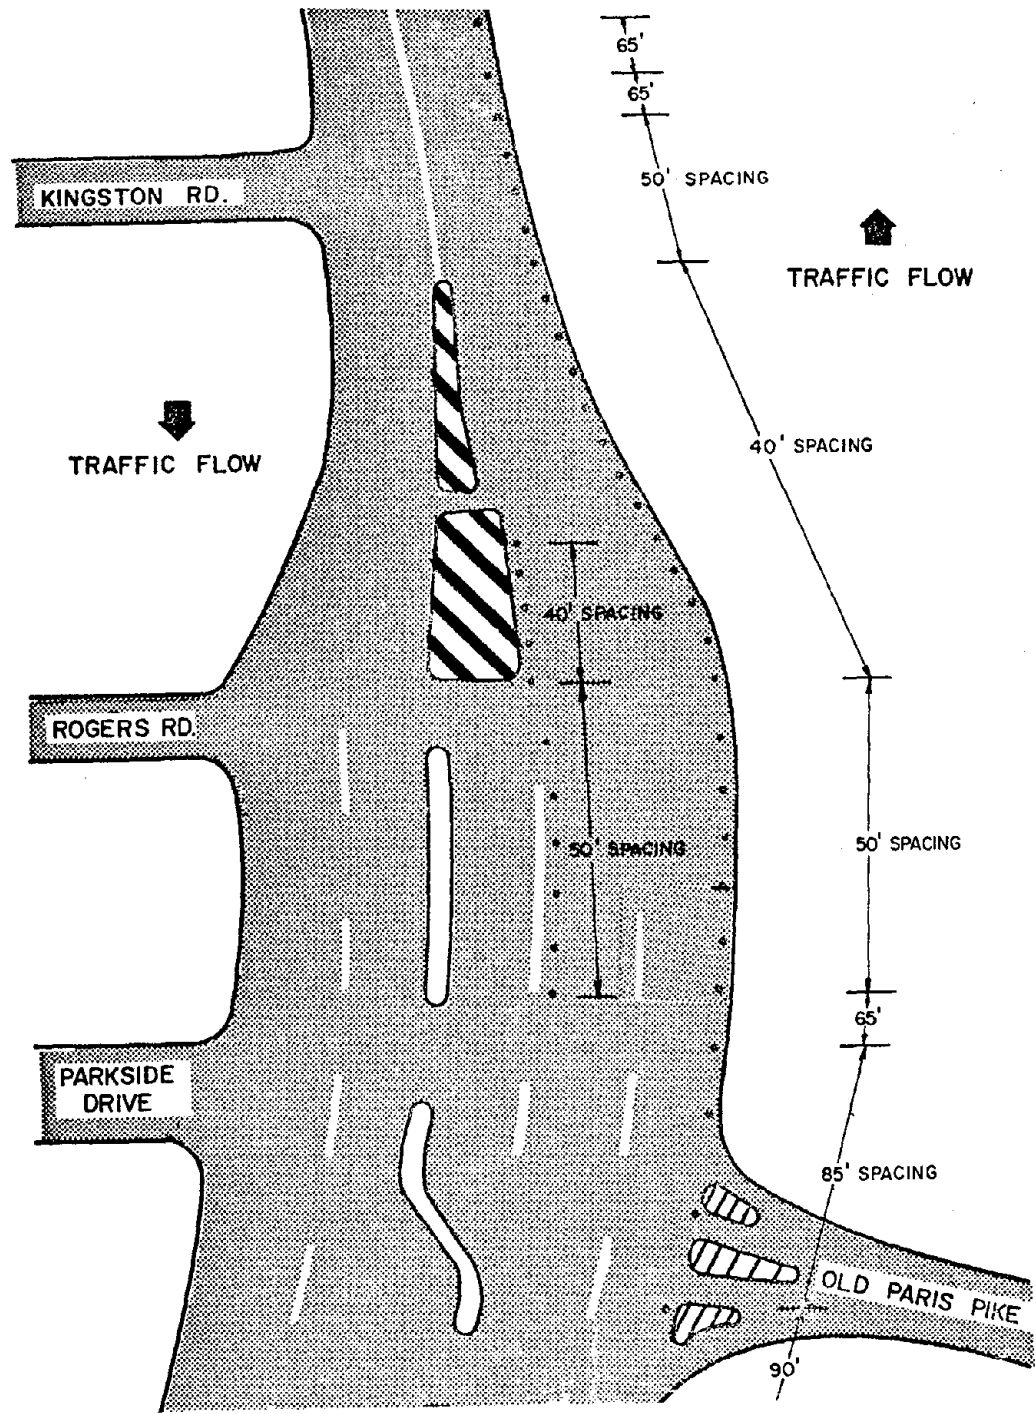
Arrangement of Raised Pavement Markers at US 27 - 68 (Paris Pike) NB Lane Termination, North of New Circle Road in Lexington. (Pigman and Agent, 1974)
